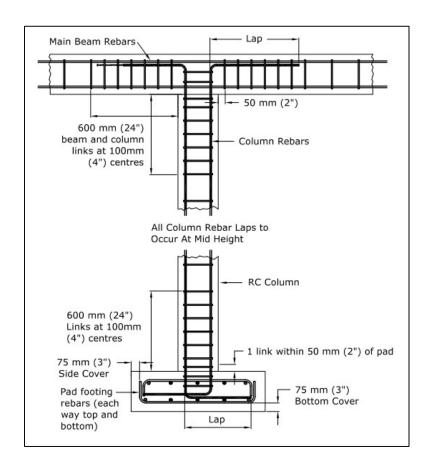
Recommended design for pad footing and columns 6.4.4.5 Slab-on-Ground footings
